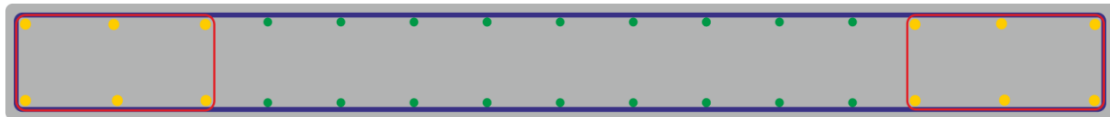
CROSS-SECTION SHOWING FOUR (OF FIVE) TYPES OF REINFORCEMENT PLACED IN A WALL. BLUE FOR HORIZONTAL REINFORCEMENT, RED FOR CONFINING REINFORCEMENT, YELLOW FOR VERTICAL REINFORCEMENT INSIDE THE CONFINING ZONE AND GREEN FOR THE VERTICAL REINFORCEMENT IN THE INNER ZONE OF THE WALL
